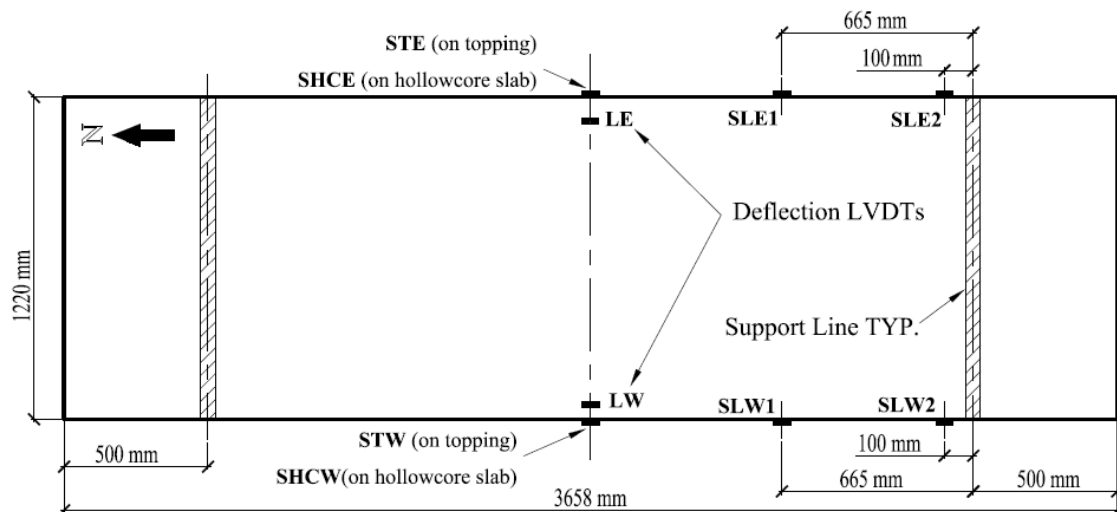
shows a typical full-scale test. The load (P) was applied at mid-span using a steel spreader beam. The figure also shows the instrumentations for slabs (FMA2-1, FRA2-3, FMB2-2 and FMB2-3) that had full concrete topping and slabs (FMA2-2C and FMB2-1C) for which the concrete topping was discontinuous. Vertical deflection was measured at mid-span using displacement gauges (LE and LW).
